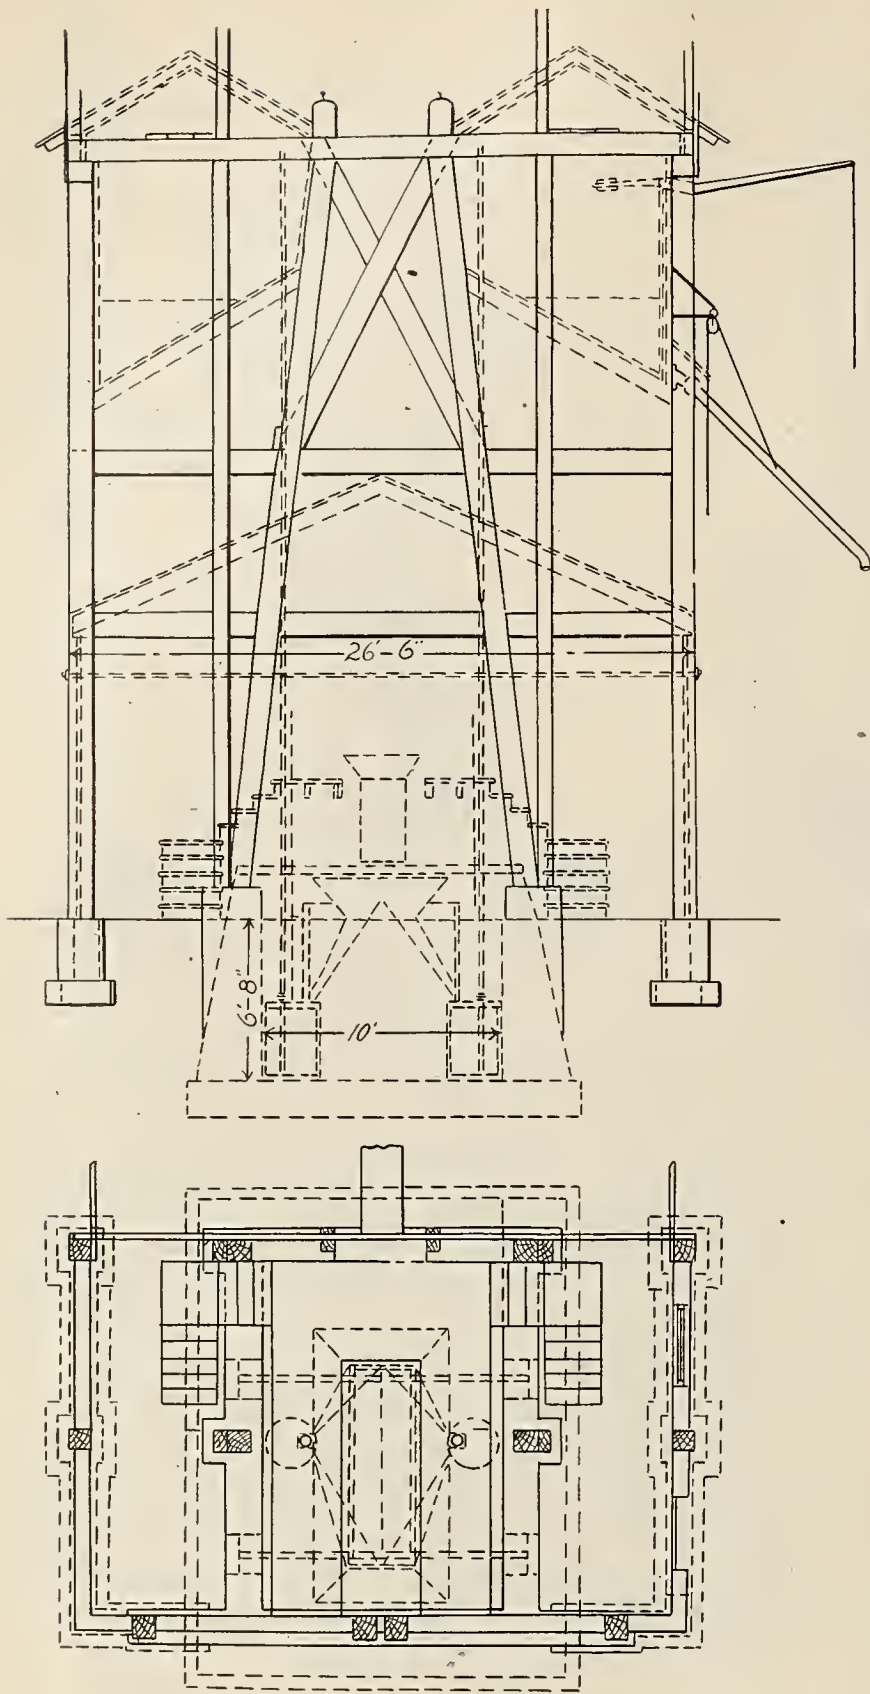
L. S. & M. S. PLAN AND ELEVATION OF SAND HOUSE.
